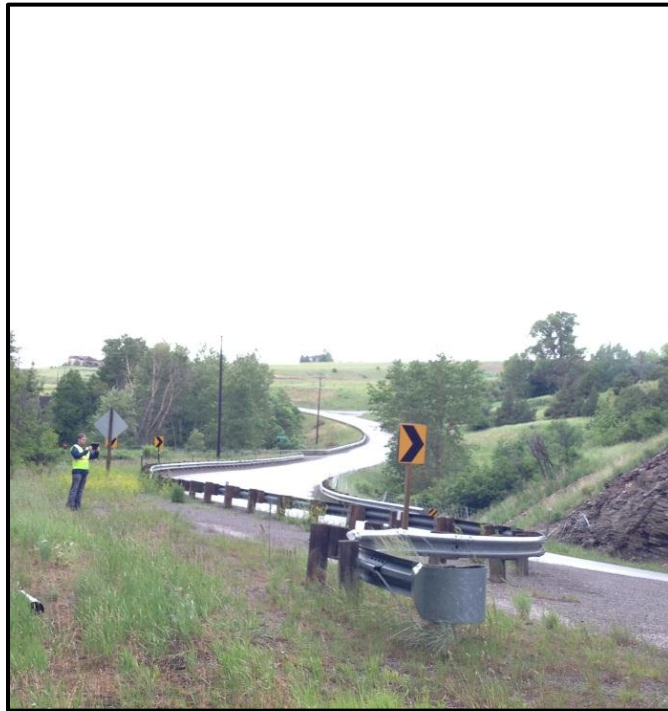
Looking north on MT 86, a rock outcropping is directly adjacent to the traveled way on the west side of the road. RP 4.4.
